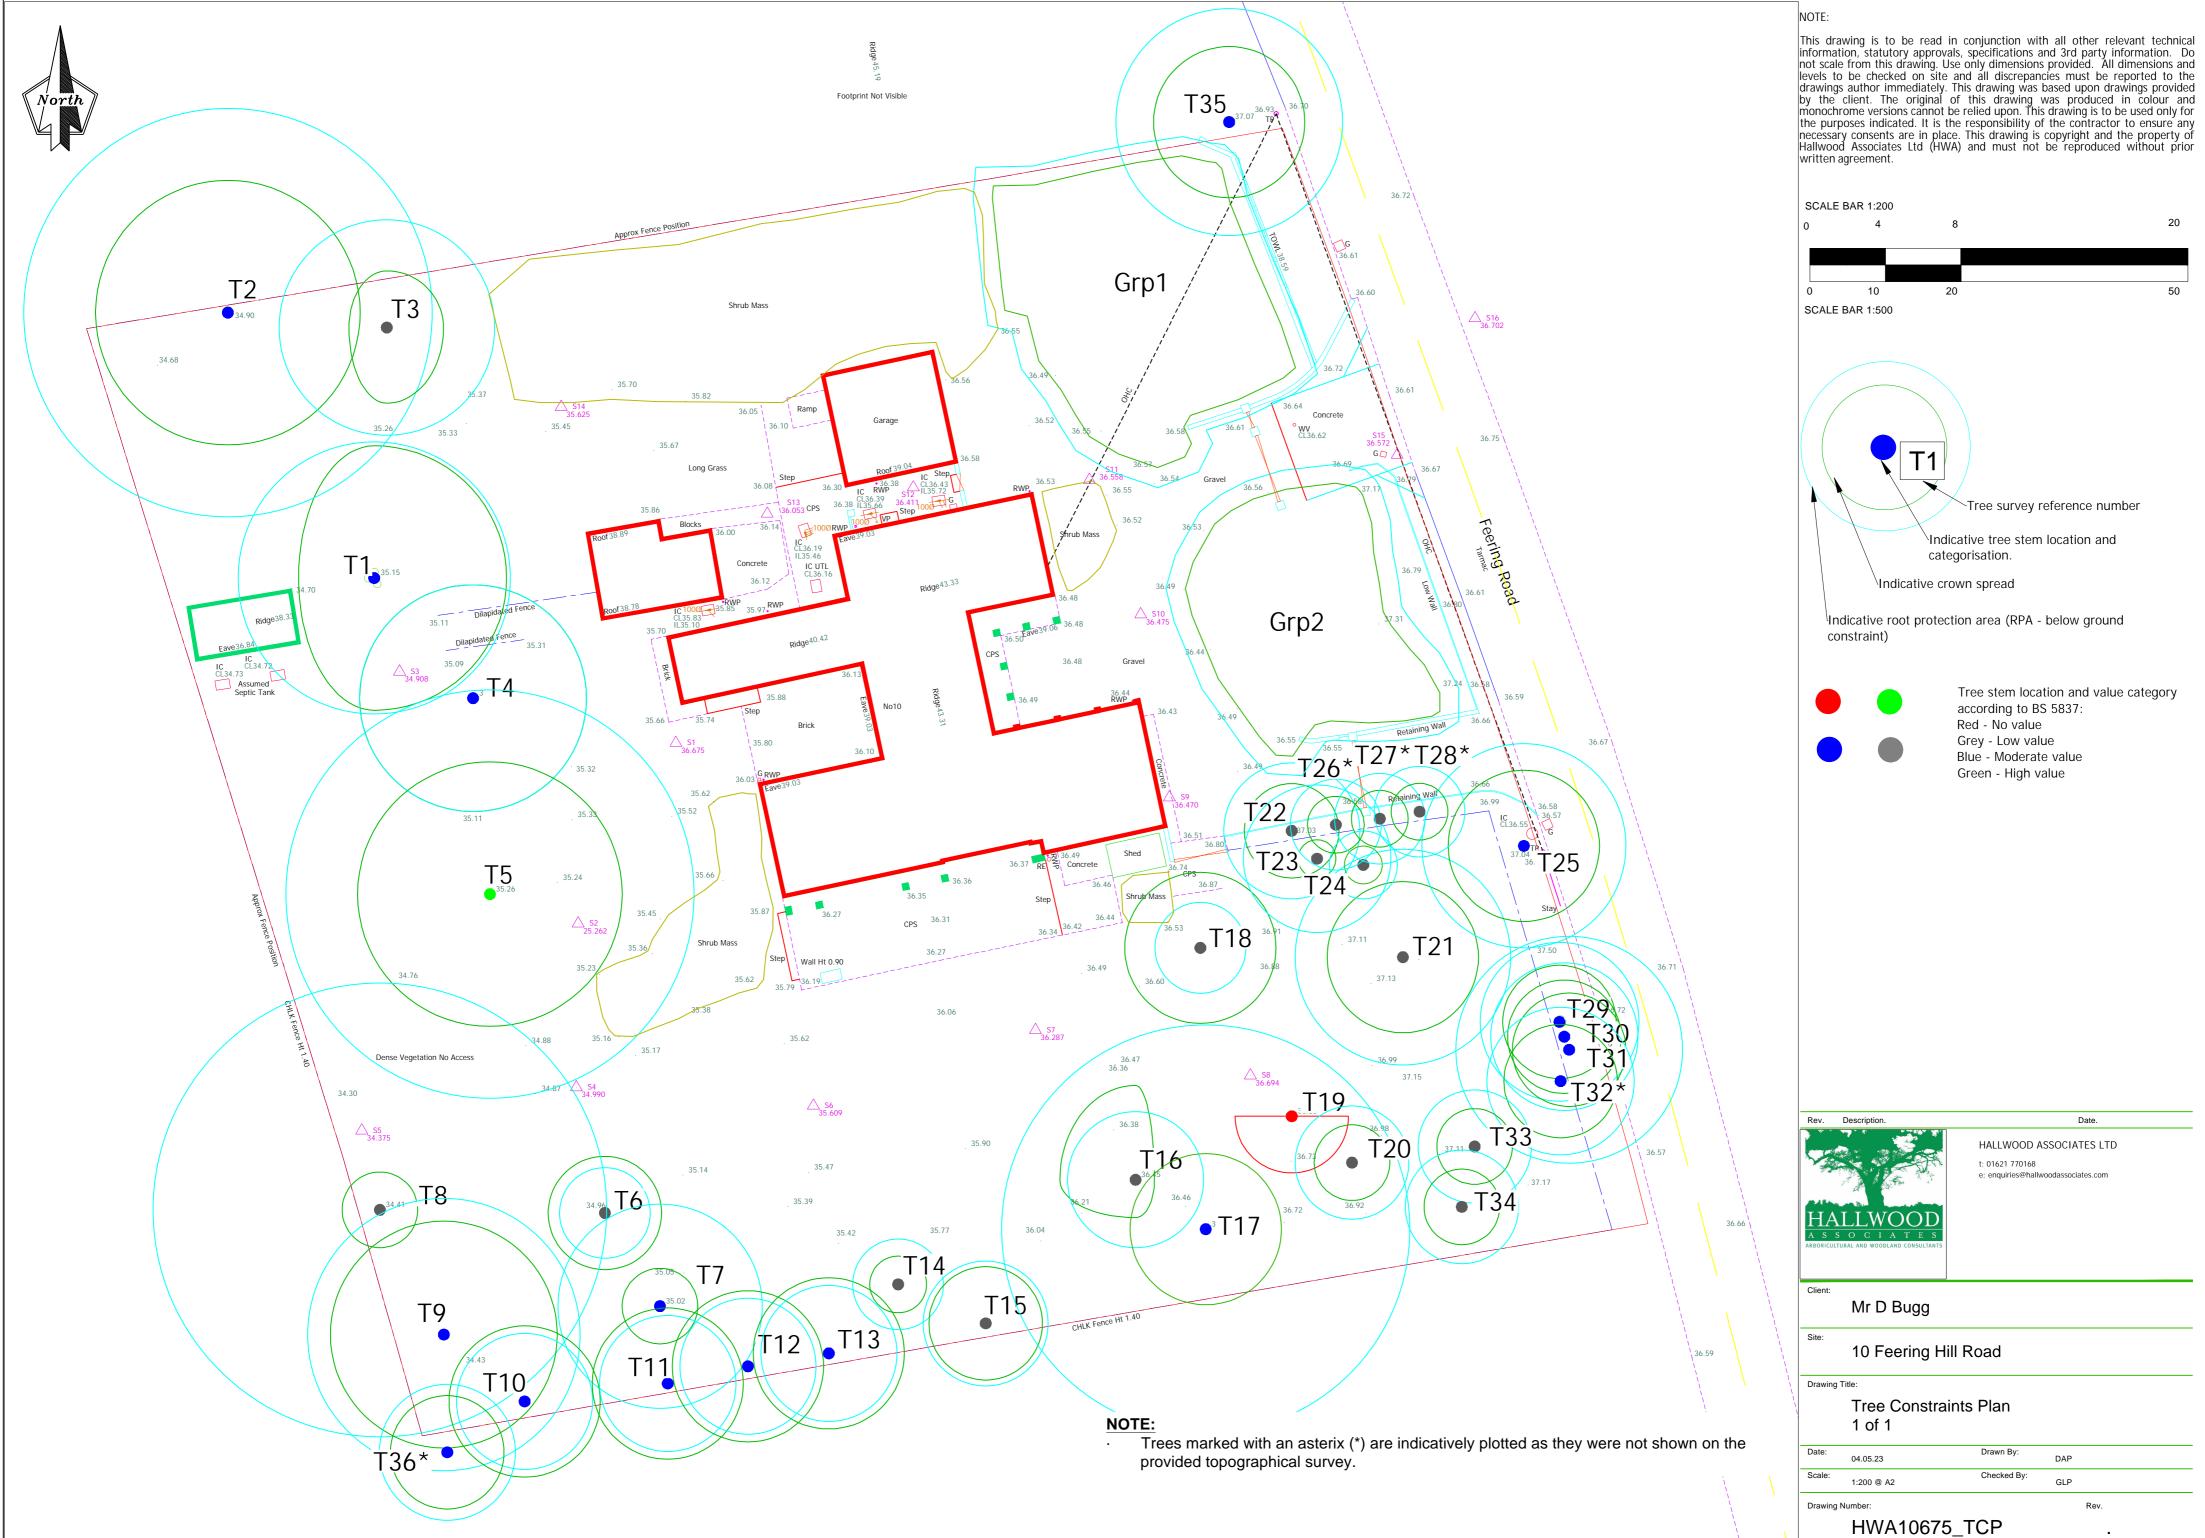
Tree Constraints Plan Figure 2: Tree Protection Plan
